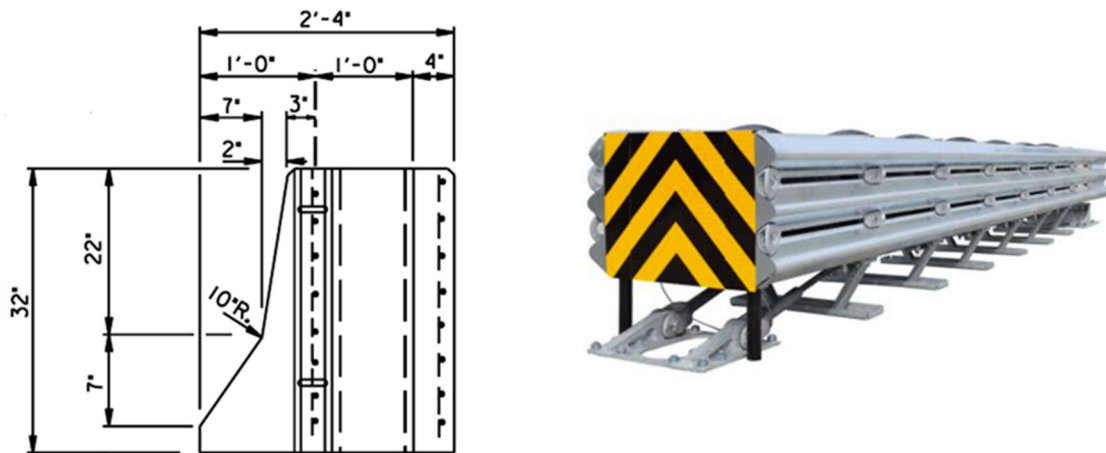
Images depicting F-shape concrete barrier section (left) and two-sided end treatment system (right).
